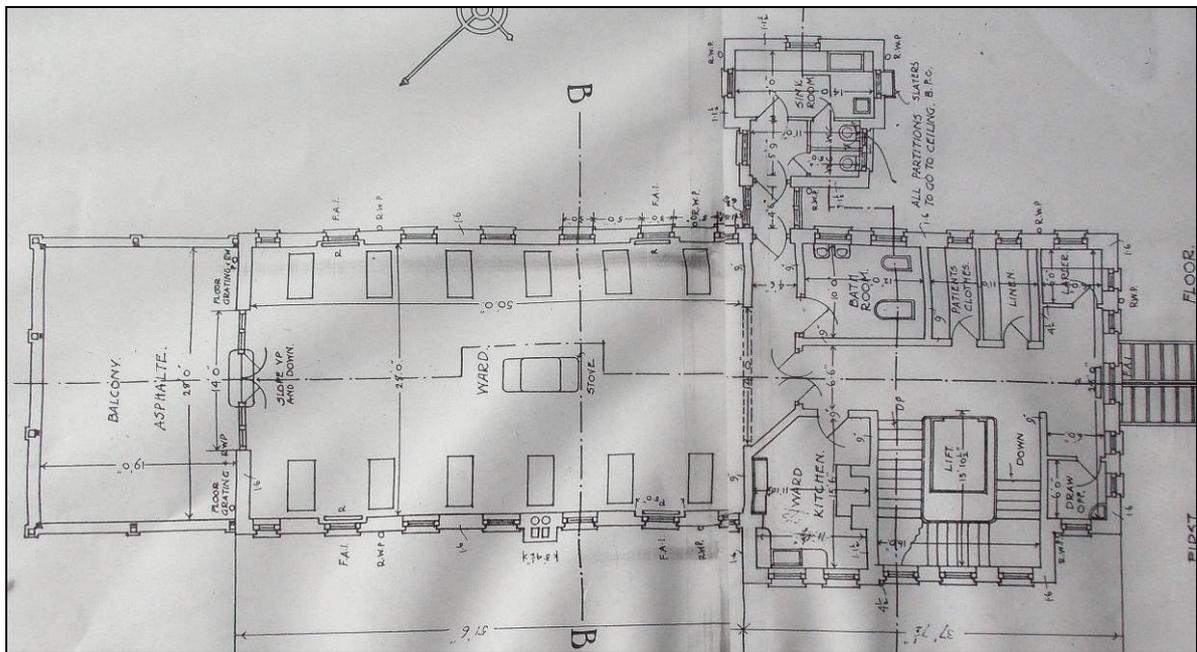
Copy of original architectural drawing of Building 41 showing the first floor.
